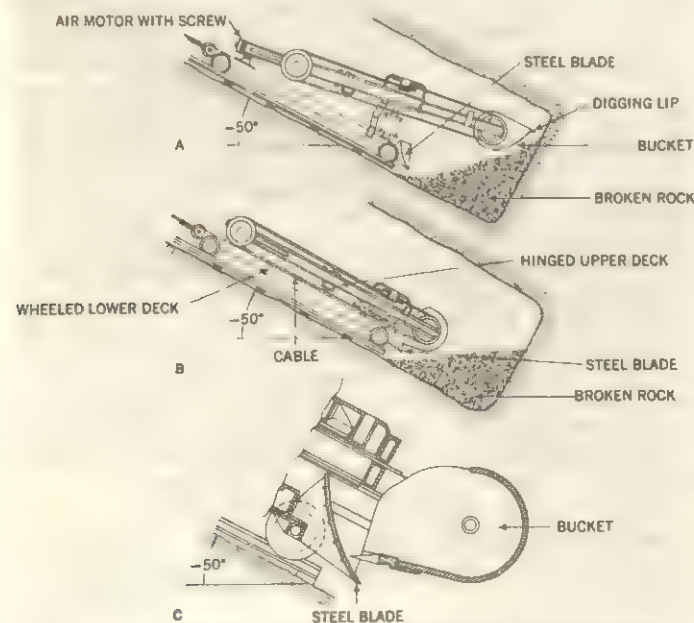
SCHEMATIC DRAWING OF MUCKING MACHINE
